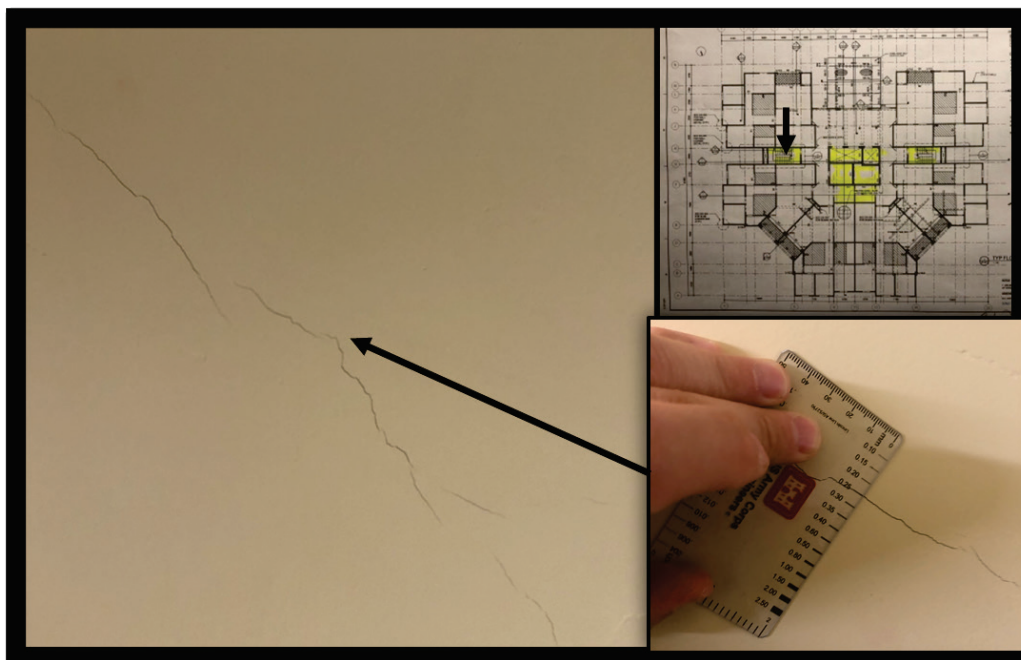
Observed cracking within Tower 3, 14th Floor stairwell (Stairway #2 of the floorplan insert). The widest area of the observed crack less than 0.25 mm. The crack did not intersect the ceilings, floors, or wall edges.
